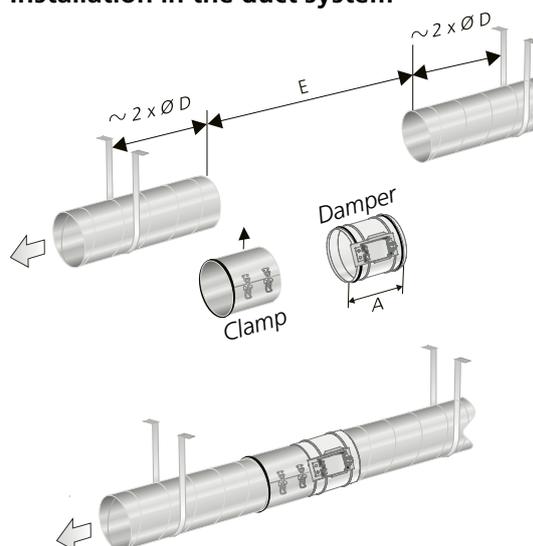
Installation in the duct system. The ducts must be firmly fixed to the frame of the building on each side of the product.
